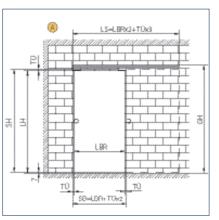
pl-01 + 10421-pl-03 (vertical sections)
